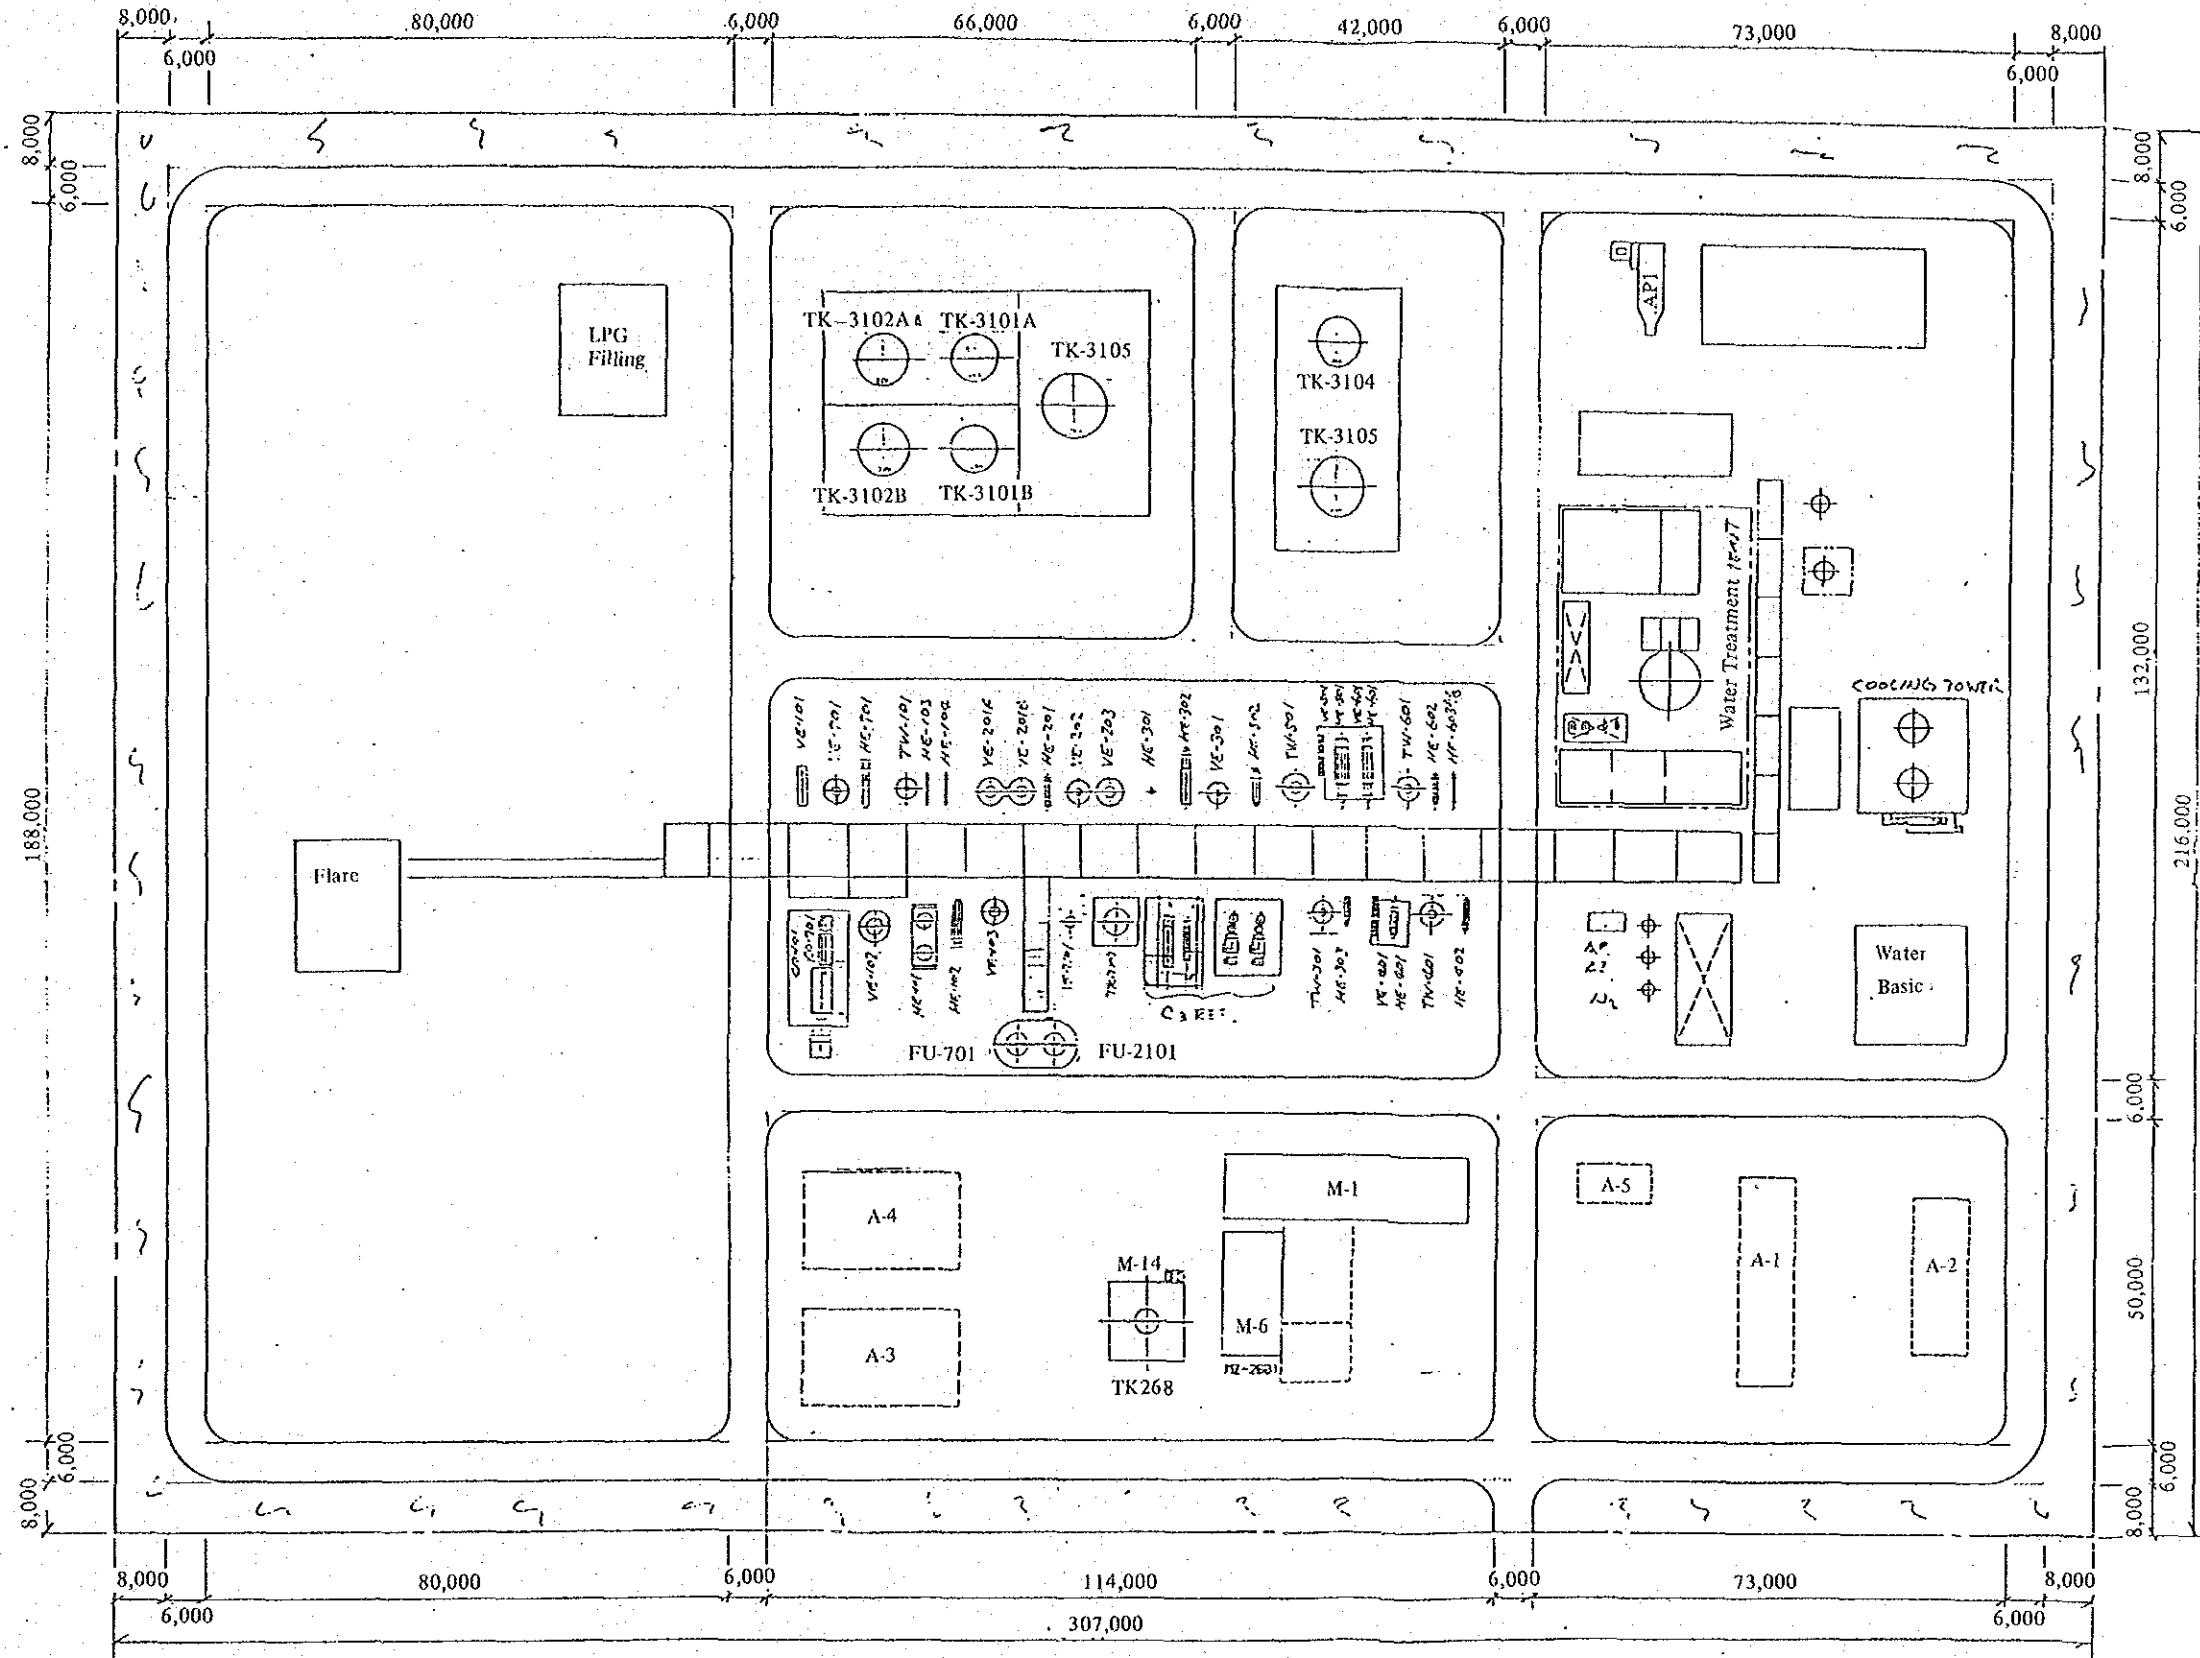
Alternated Plot Plan for Kyangin Plant Site
